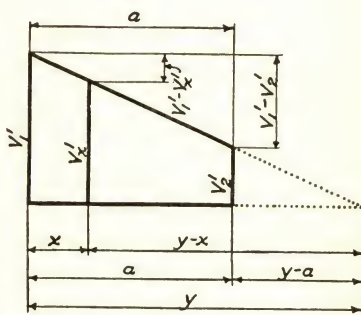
STIRRUP SPACING FOR CASE I (ENLARGED FROM FIG. 9).
